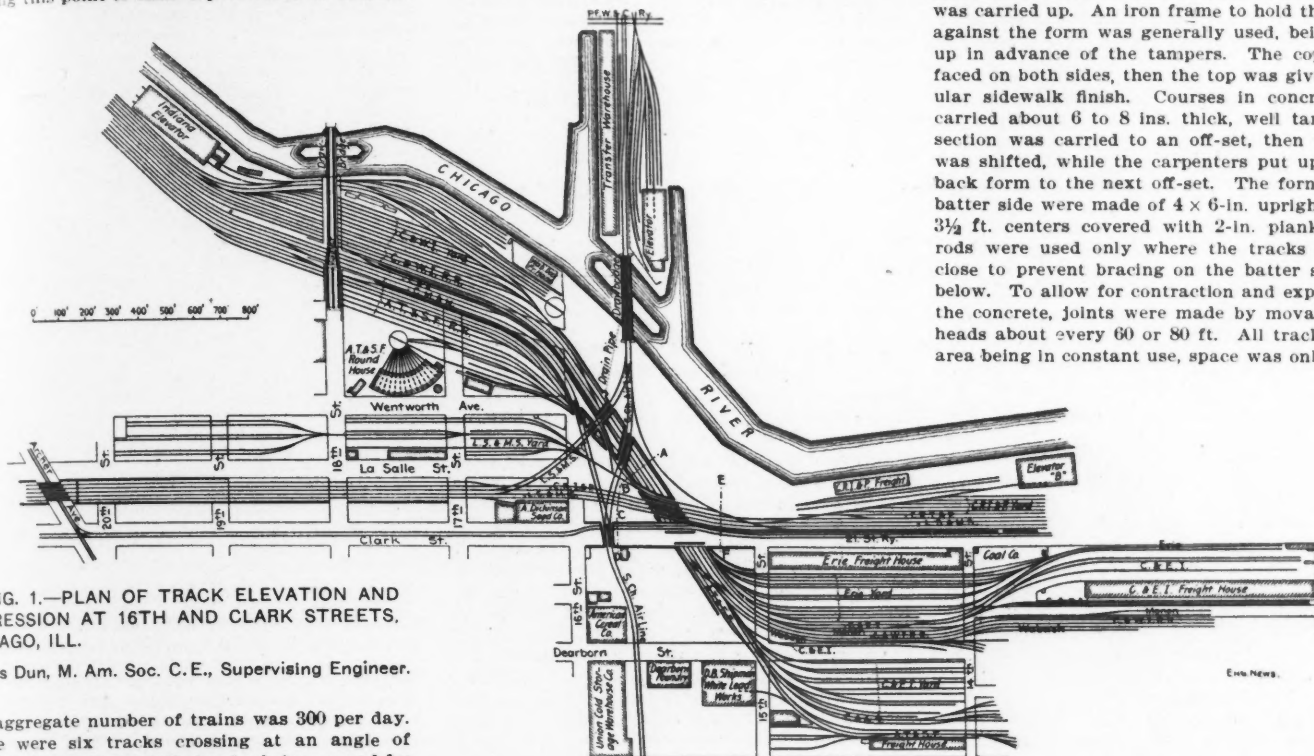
PLAN OF TRACK ELEVATION AND DEPRESSION AT 16TH AND CLARK STREETS, CHICAGO, ILL.
